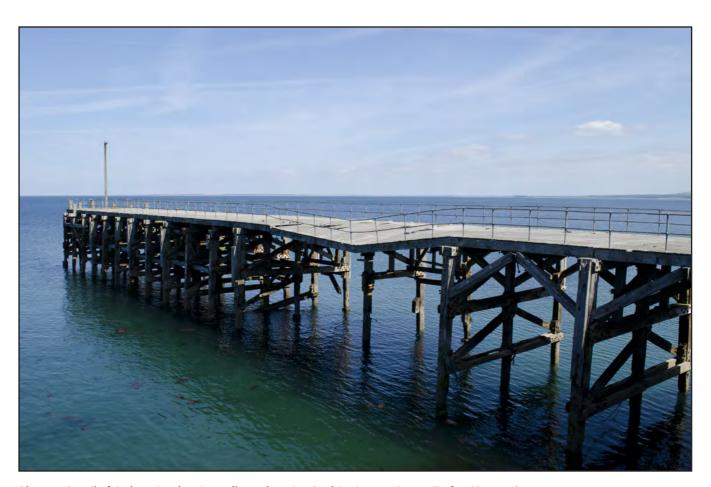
Detail of timber pier showing collapsed section (archive image: G2475_Trefor_Pier_005)
